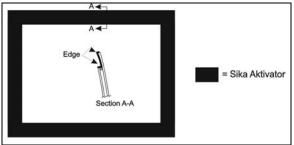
FACE FIXED WINDOW AND HALF-WINDOW – SIKA AKTIVATOR
